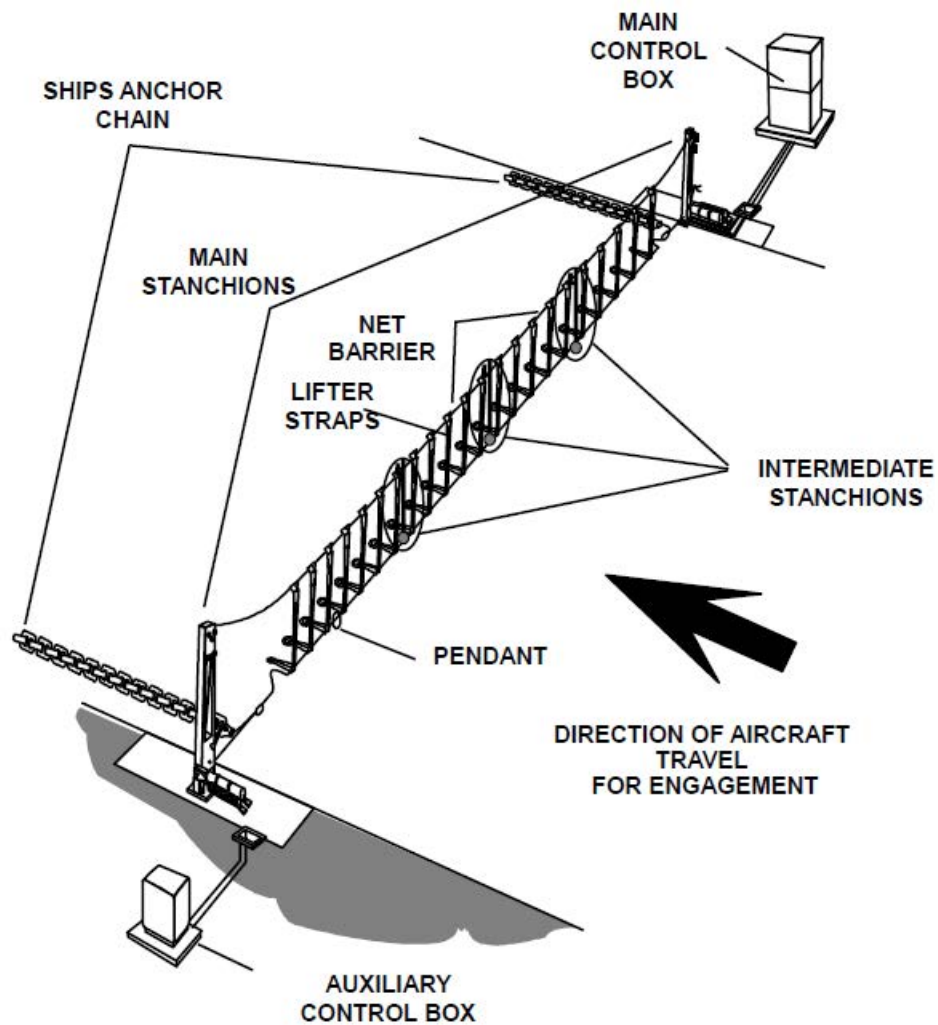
MA-1A Modified Barrier With Hook Cable Interconnect
